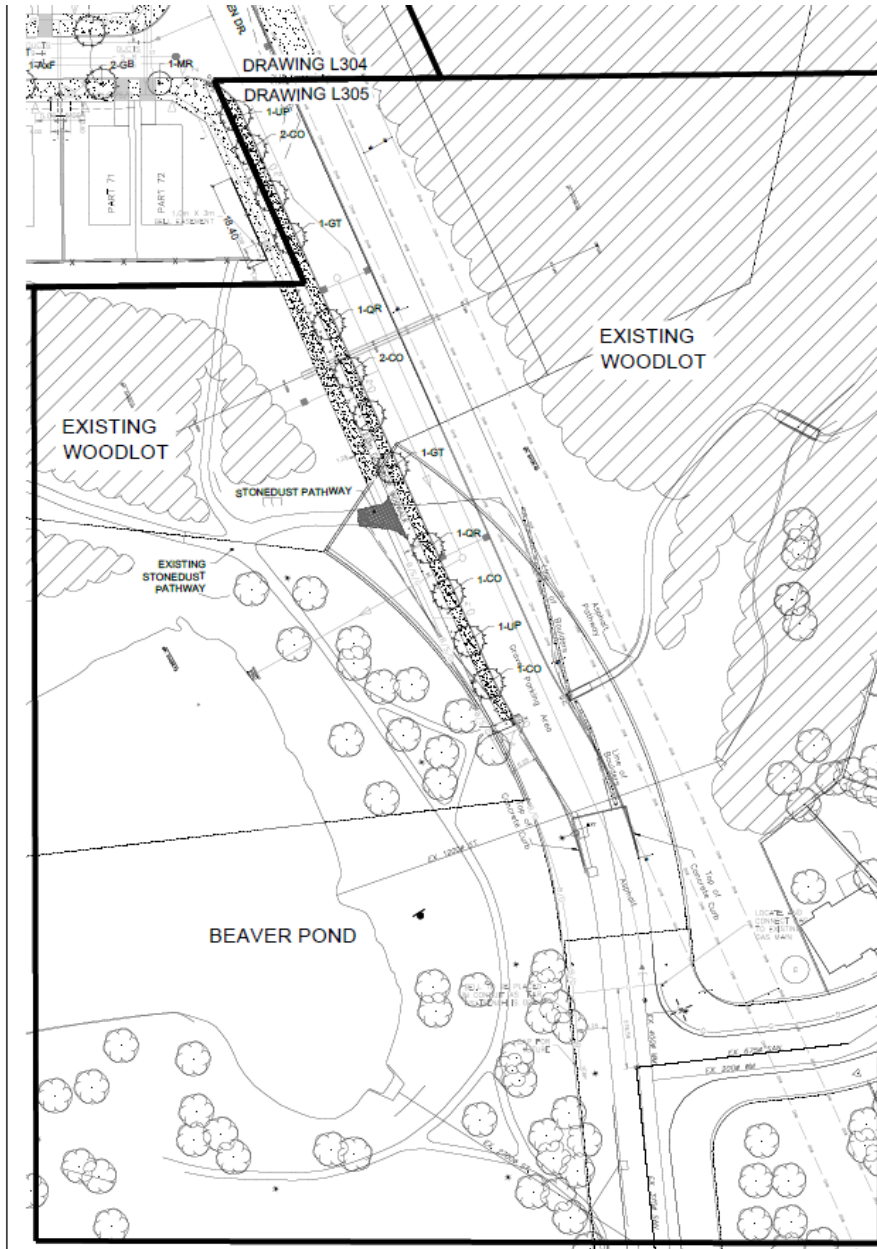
(Excerpt of Phase 9 Landscape Plan –Beaver Pond and ROW extension to Walden Drive)
